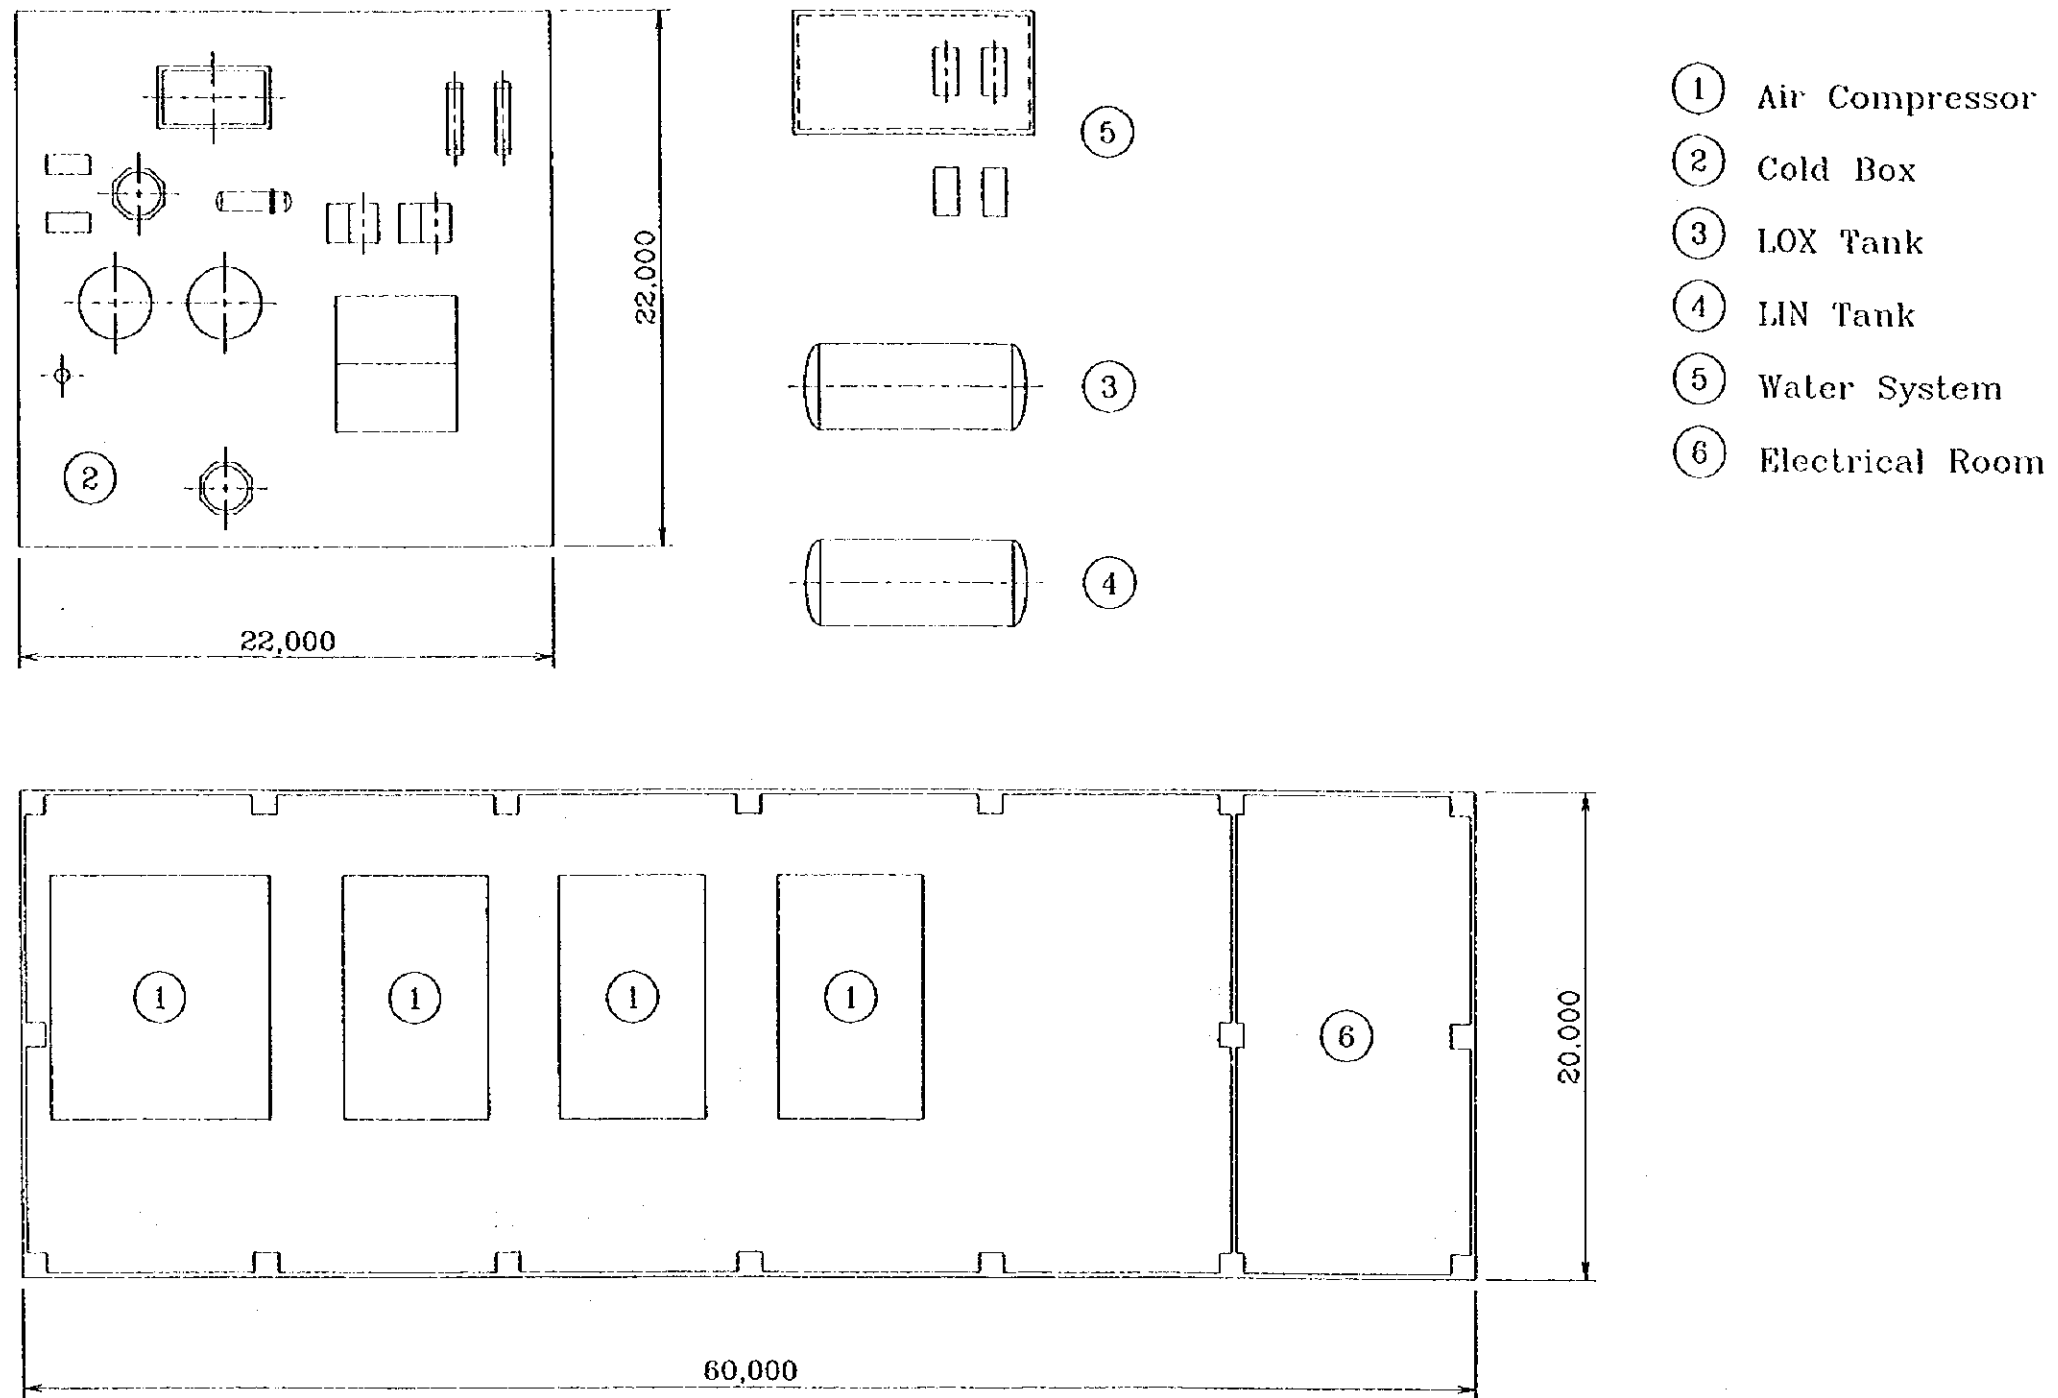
Layout of Air Separation Plant and Plant Air
